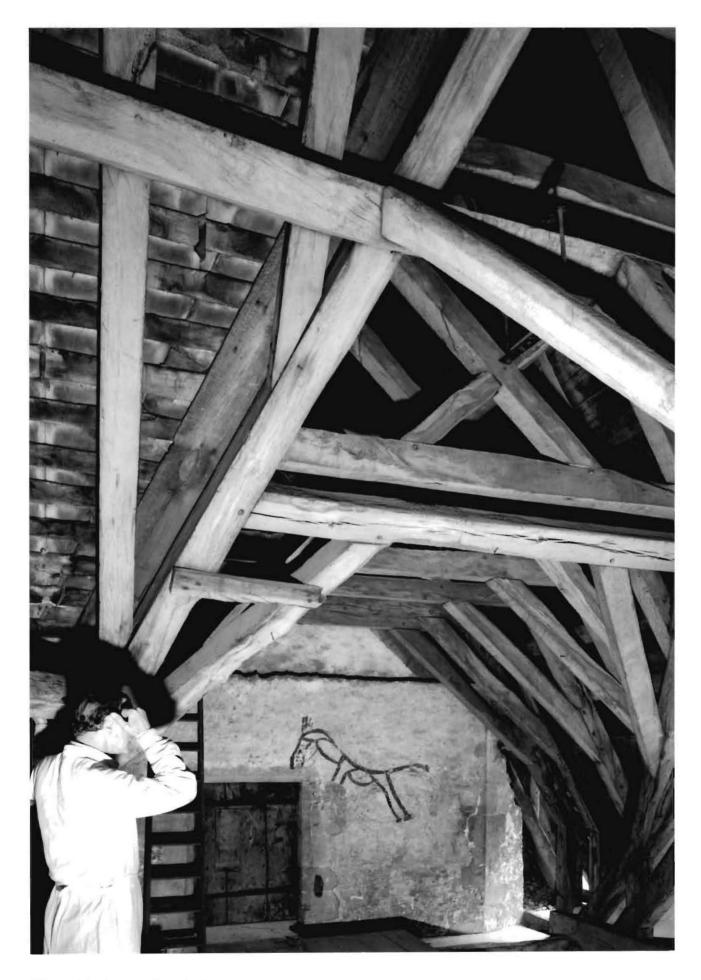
Intersection of scissors-braced north porch roof and north nave triforium. © Crown copyright. NMR. BB71/2502
